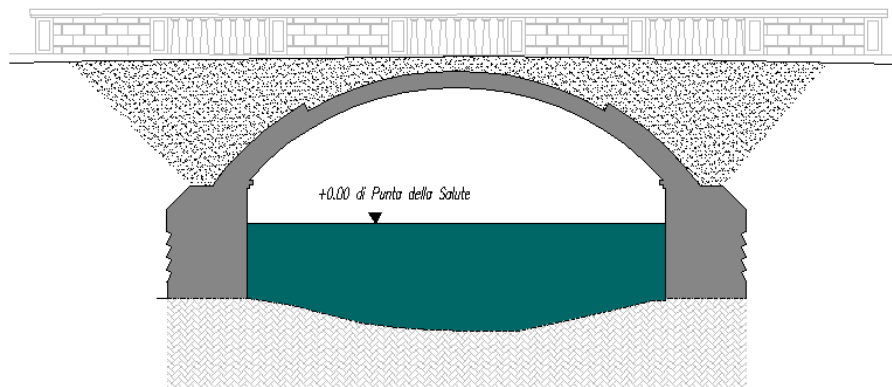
Plan view showing area of excavated fill. (Modena, 2004)
